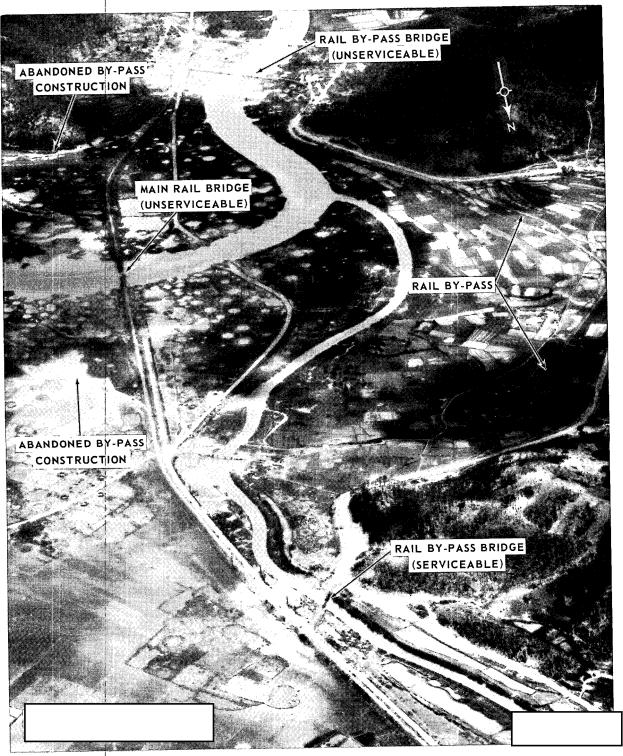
RAILROAD RIVER CROSSINGS, TRAI CU, NORTH VIETNAM
